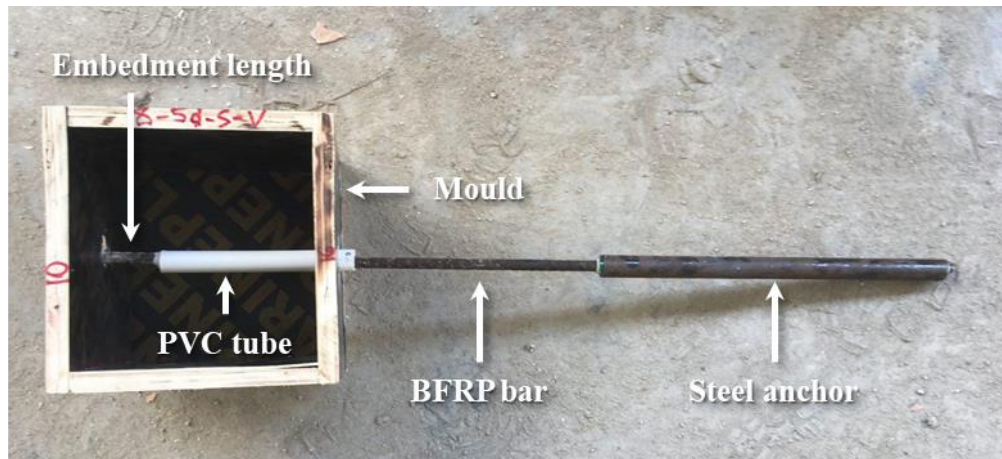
Pull-out mould before casting, containing BFRP bar and PVC tube.
